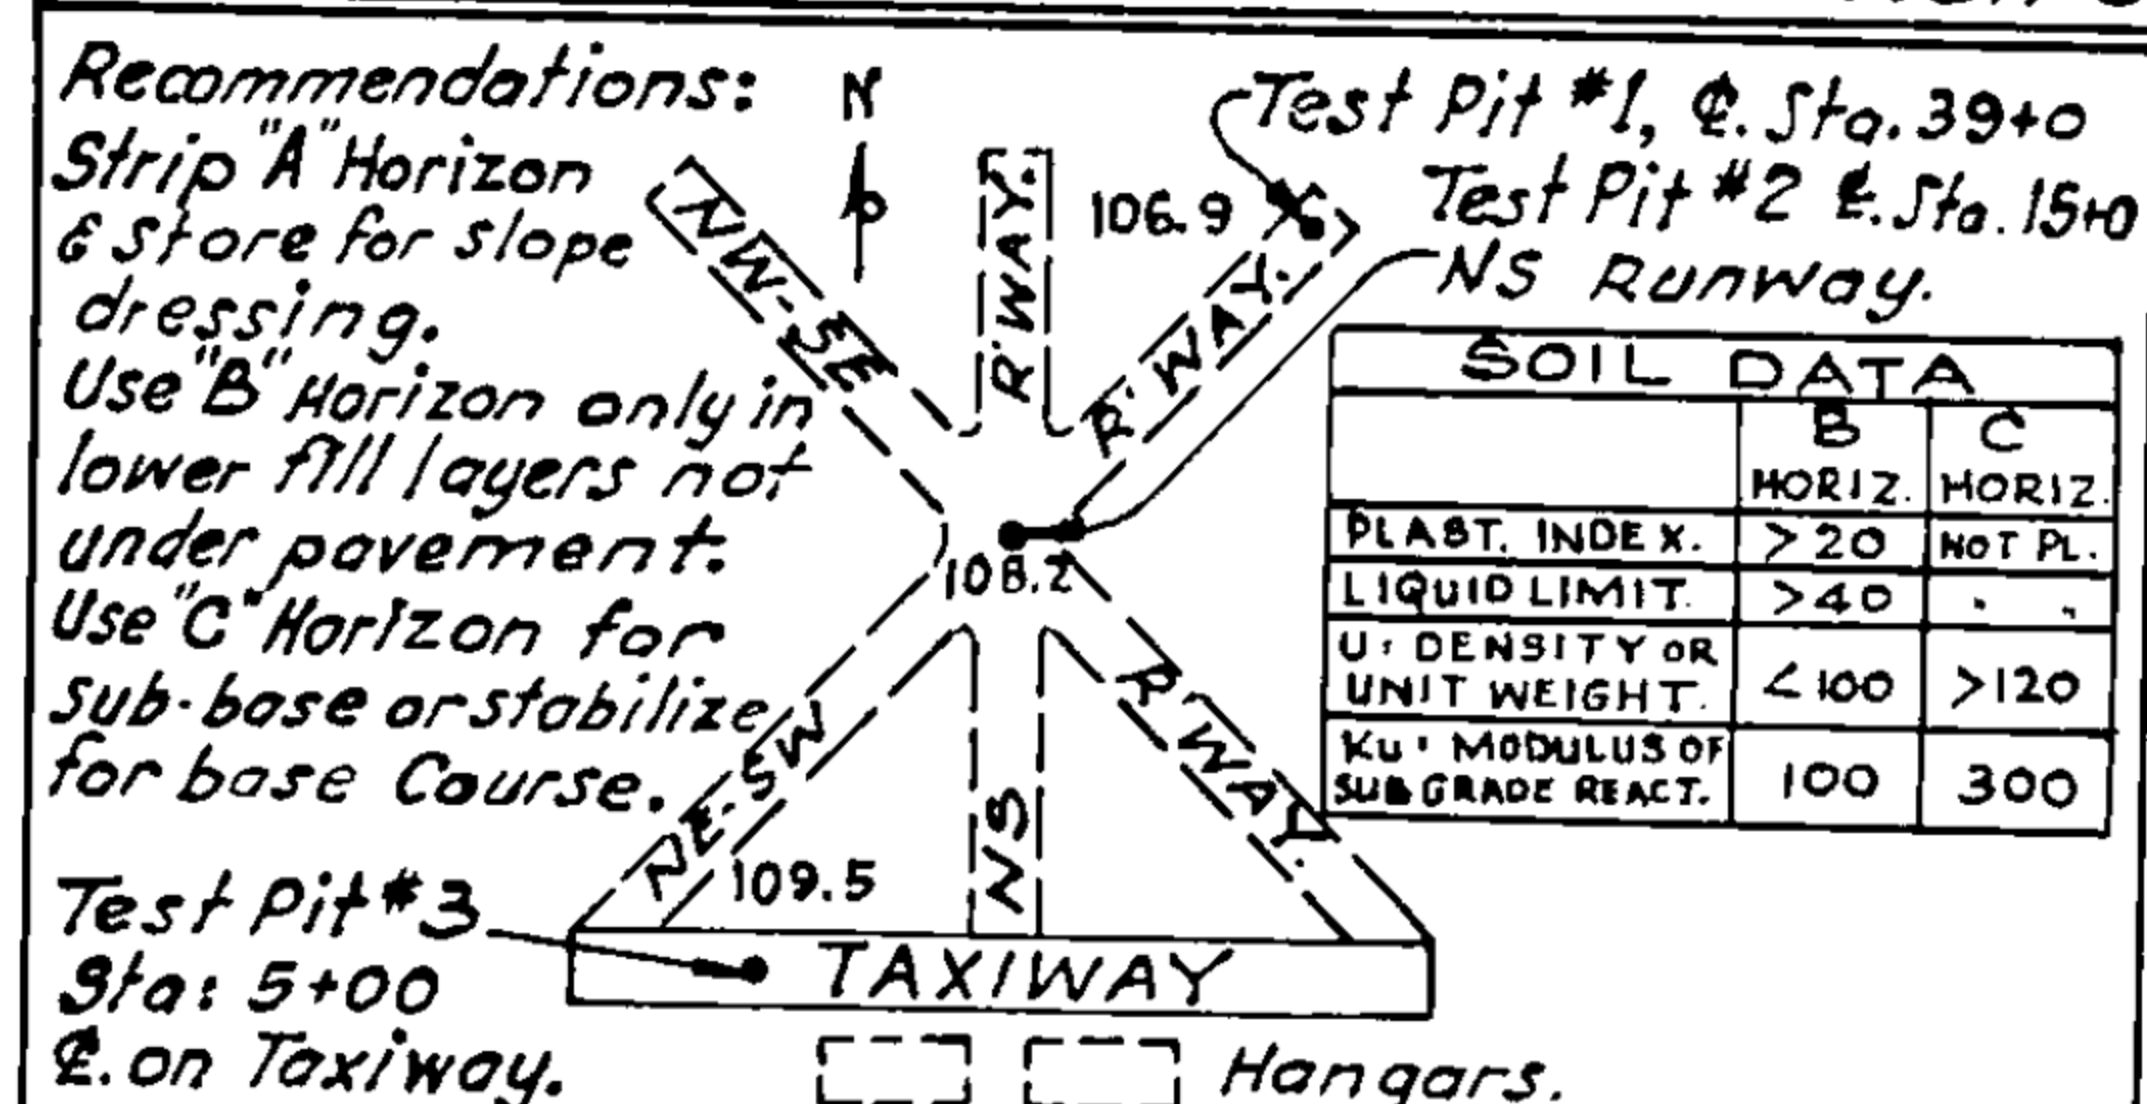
FIG. B - PLAN & LOG OF TEST PITS FOR AIRFIELD.
